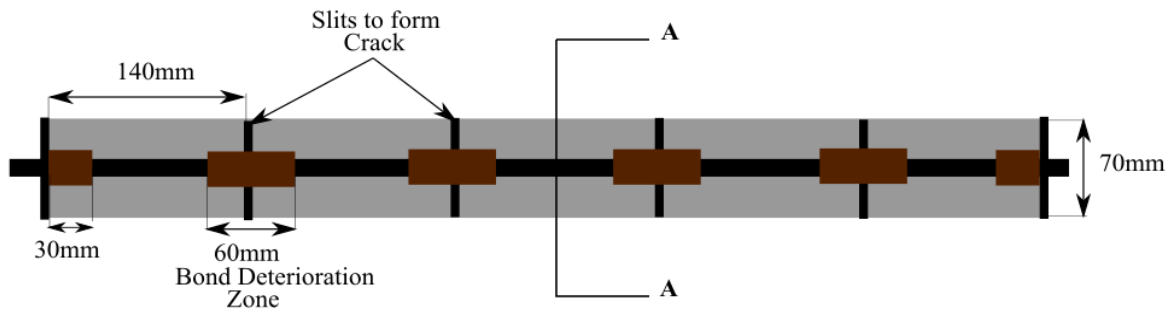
Positioning of slits and bond deterioration zones in the damaged bond section
